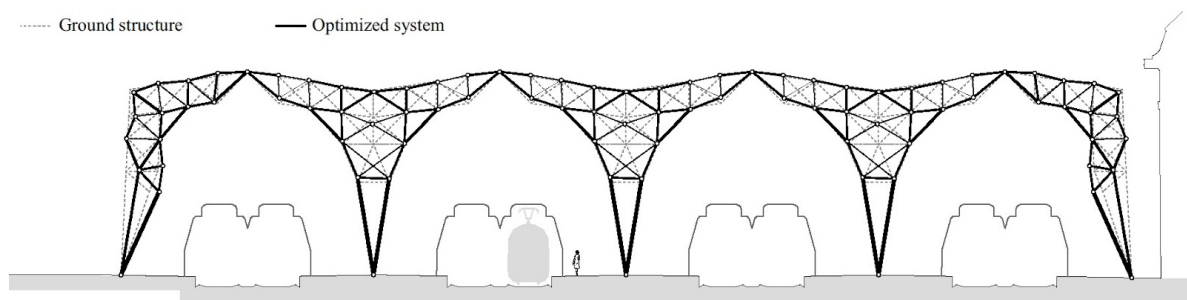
Optimal transversal section layout (from Brütting et al., 2018).
